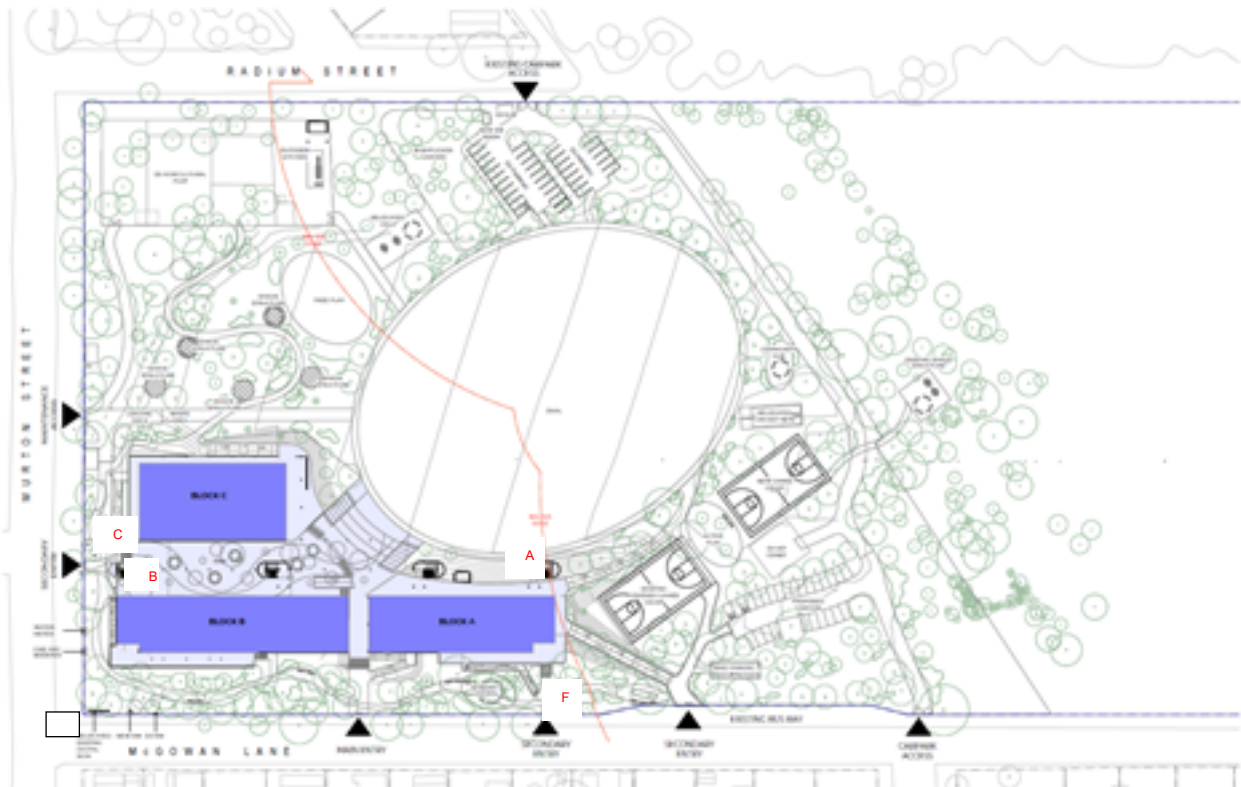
Site Architectural Plan-Provided by Woods Bagot
